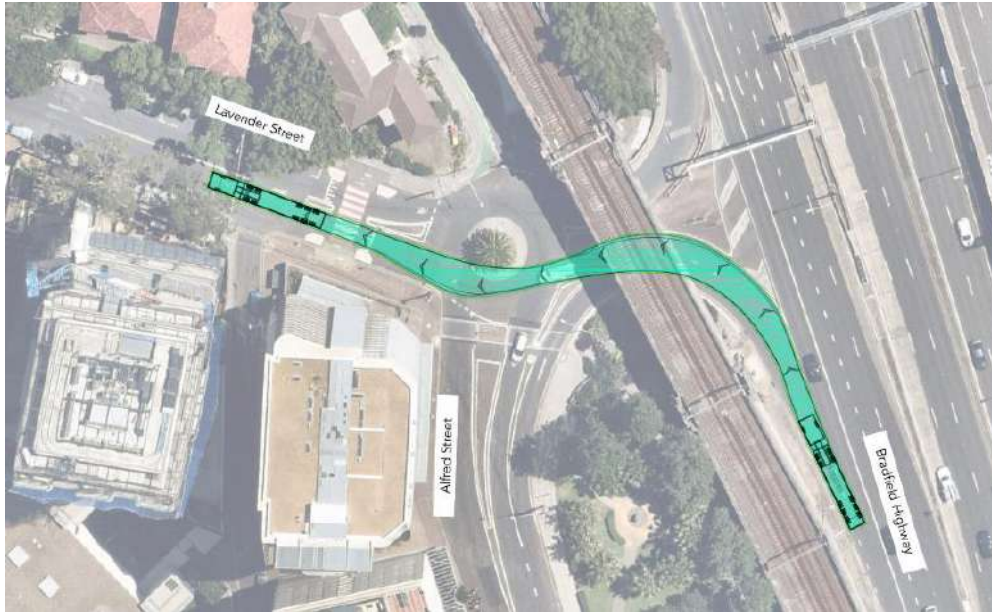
19m AV (Sem-Trailer) Turning Left into Lavender Street from Bradfield Highway
